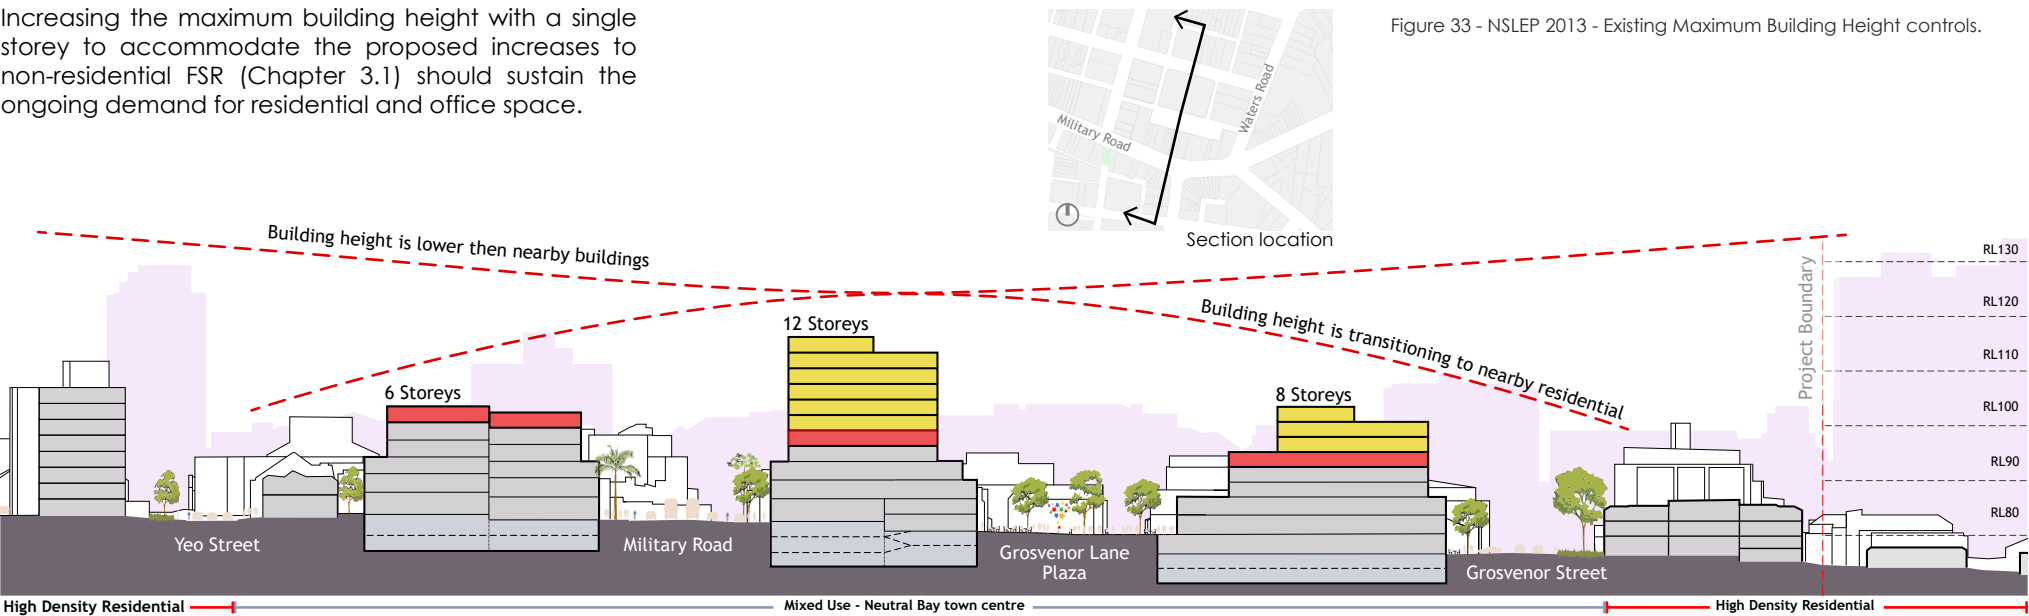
North-south section through Neutral Bay town centre looking west. New height limits will meet the demand for non-residential floorspace (pink) with a few taller residential towers (yellow) to help provide much needed public benefits. Details on Planning Proposal and VPAs can be found in Chapter 3.4.
